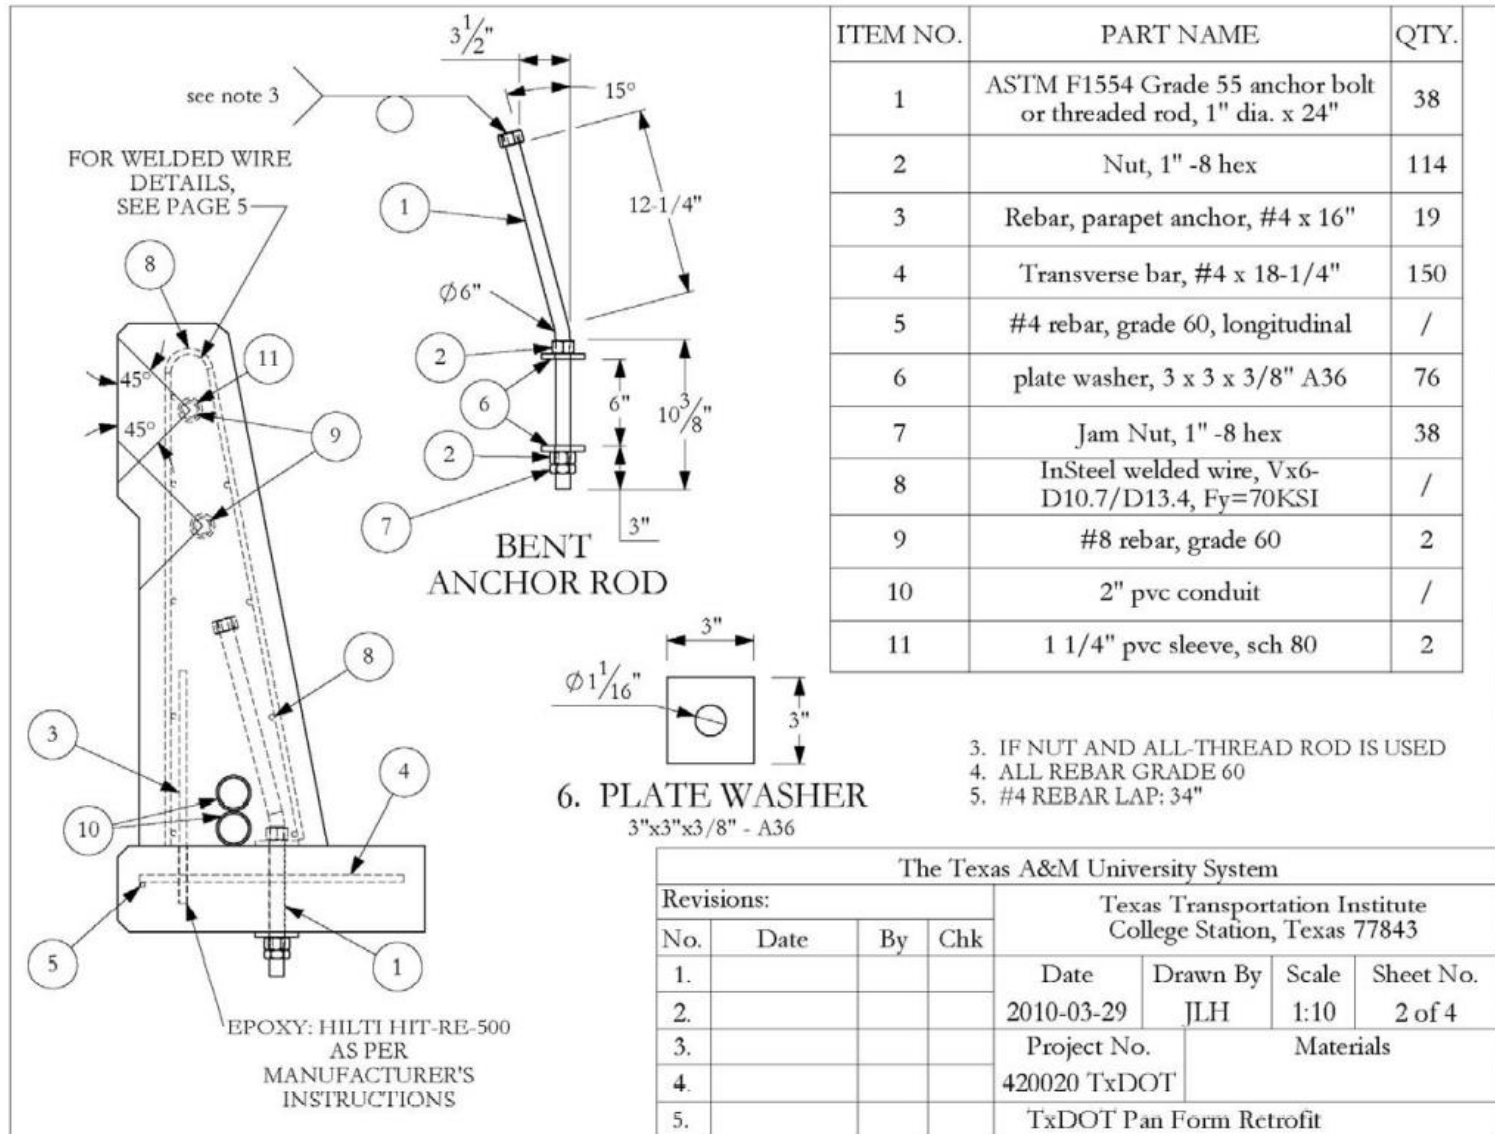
Design Drawings for TxDOT Pan Form Retrofit Bridge Rail [13]
